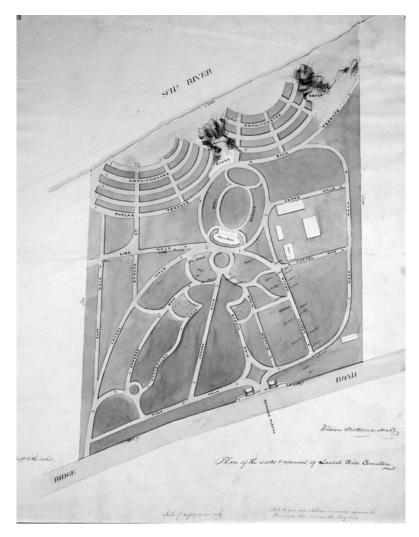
William Strickland, *Plan of the walks and avenues of Laurel Hill Cemetery* ([Philadelphia, 1836]). William Strickland's proposed ground plan for Laurel Hill Cemetery. Library Company of Philadelphia.
